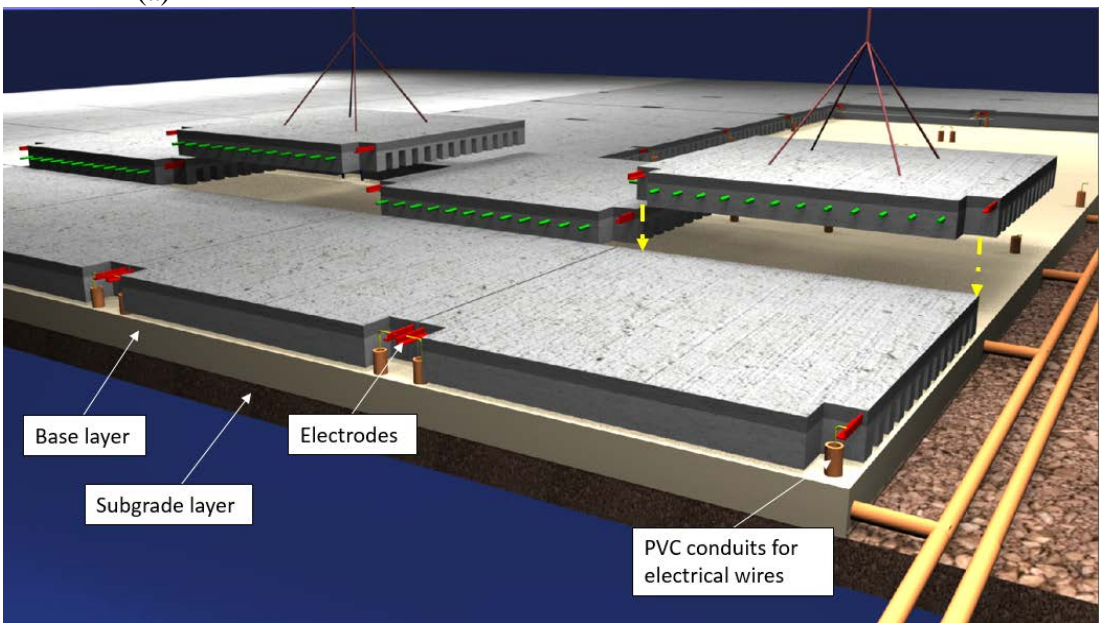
Preparing the base layer and installing PVC conduits and junction box
